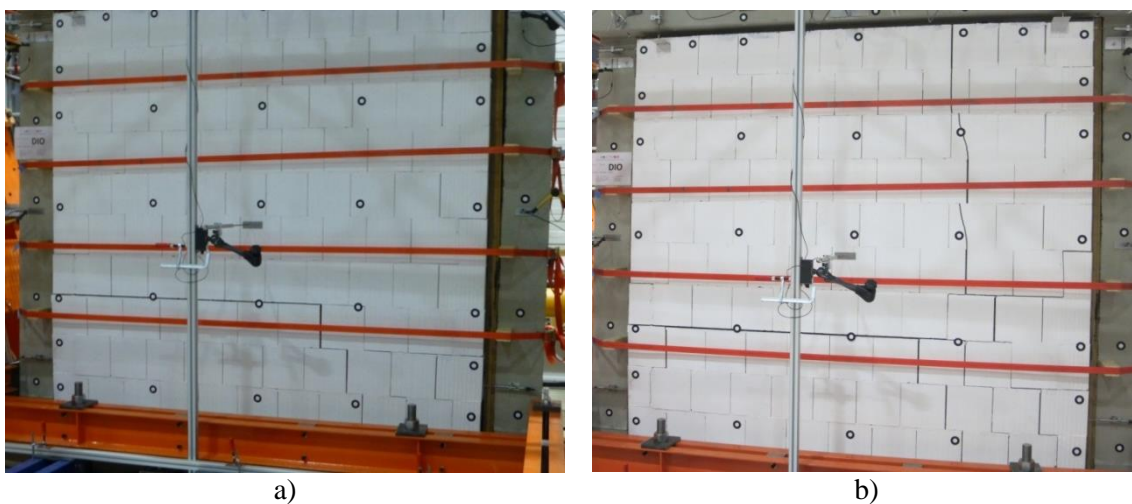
a) Appearance of the first crack in the wall and b) cracks in the wall at the end of phase 4
